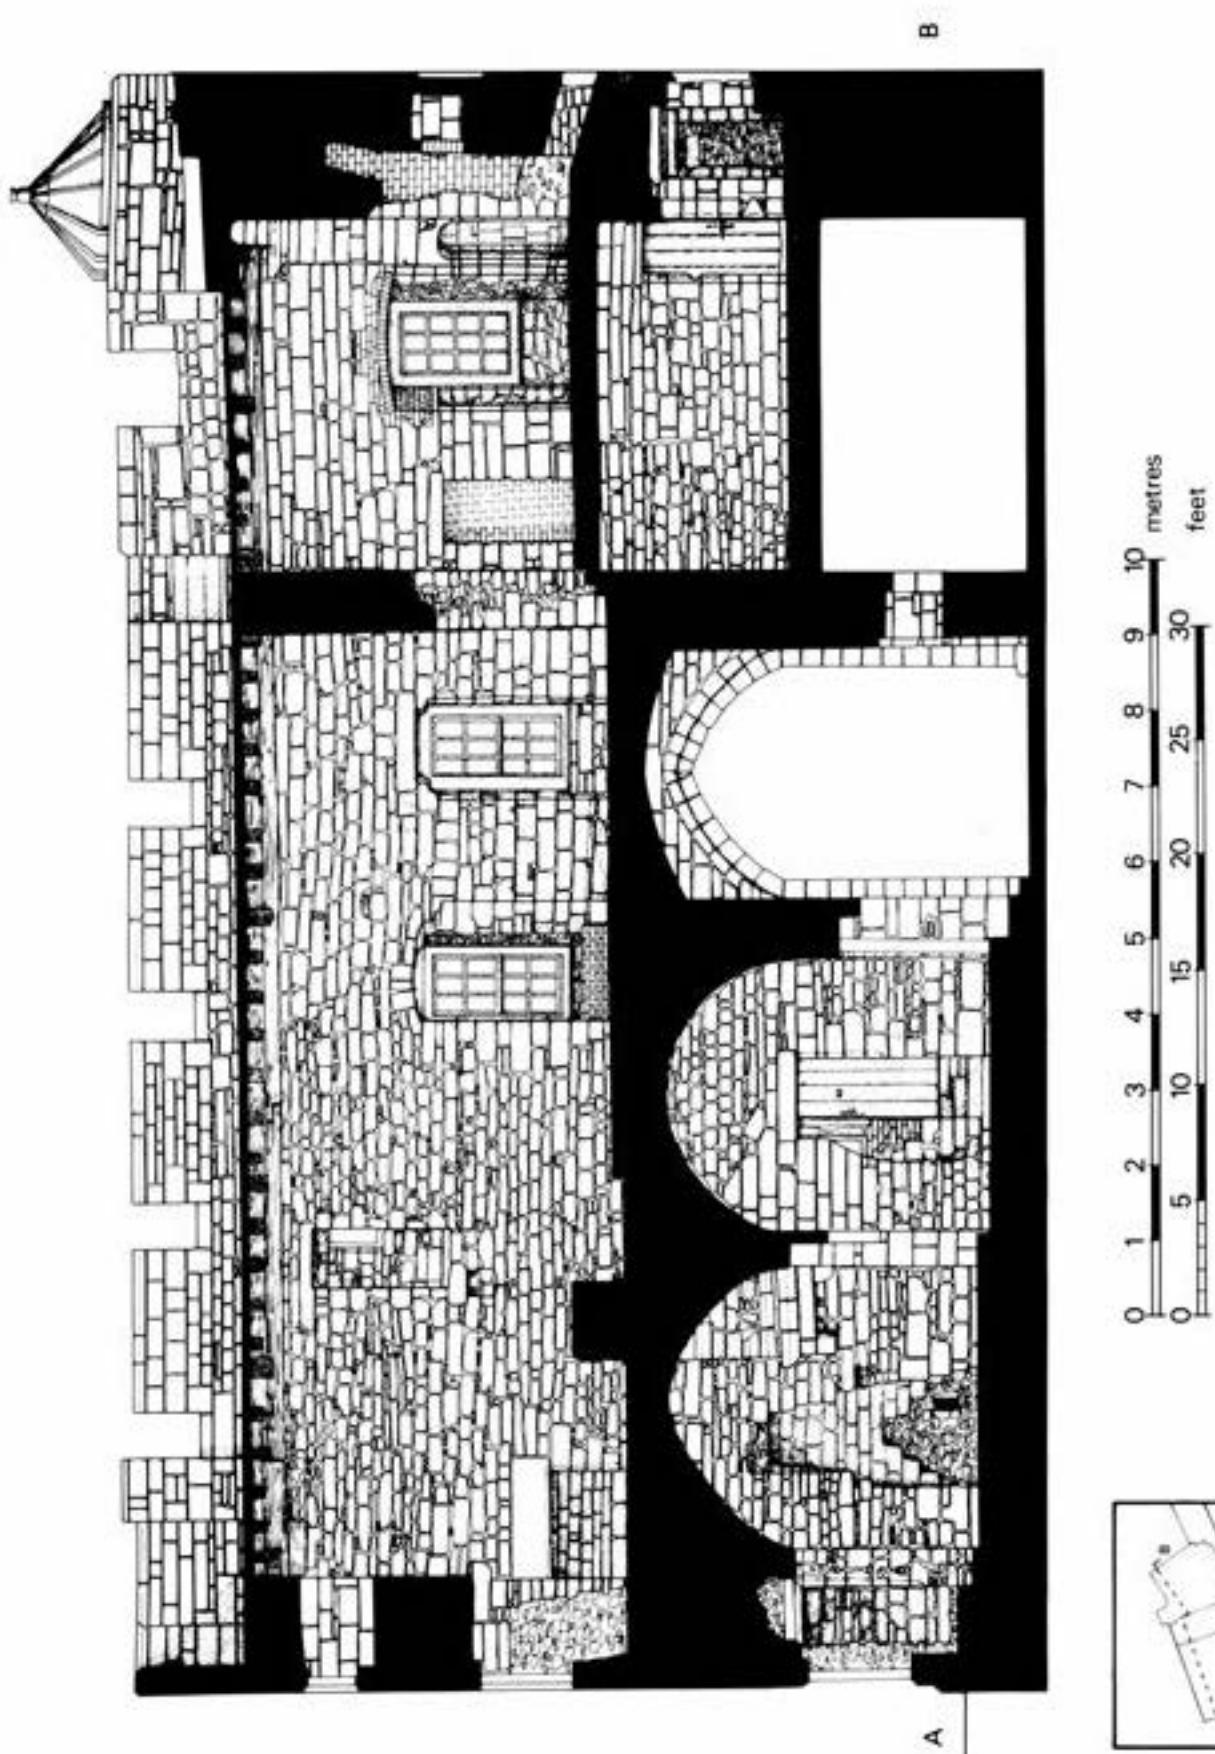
The outer gatehouse; internal east-west elevation of the north wall
